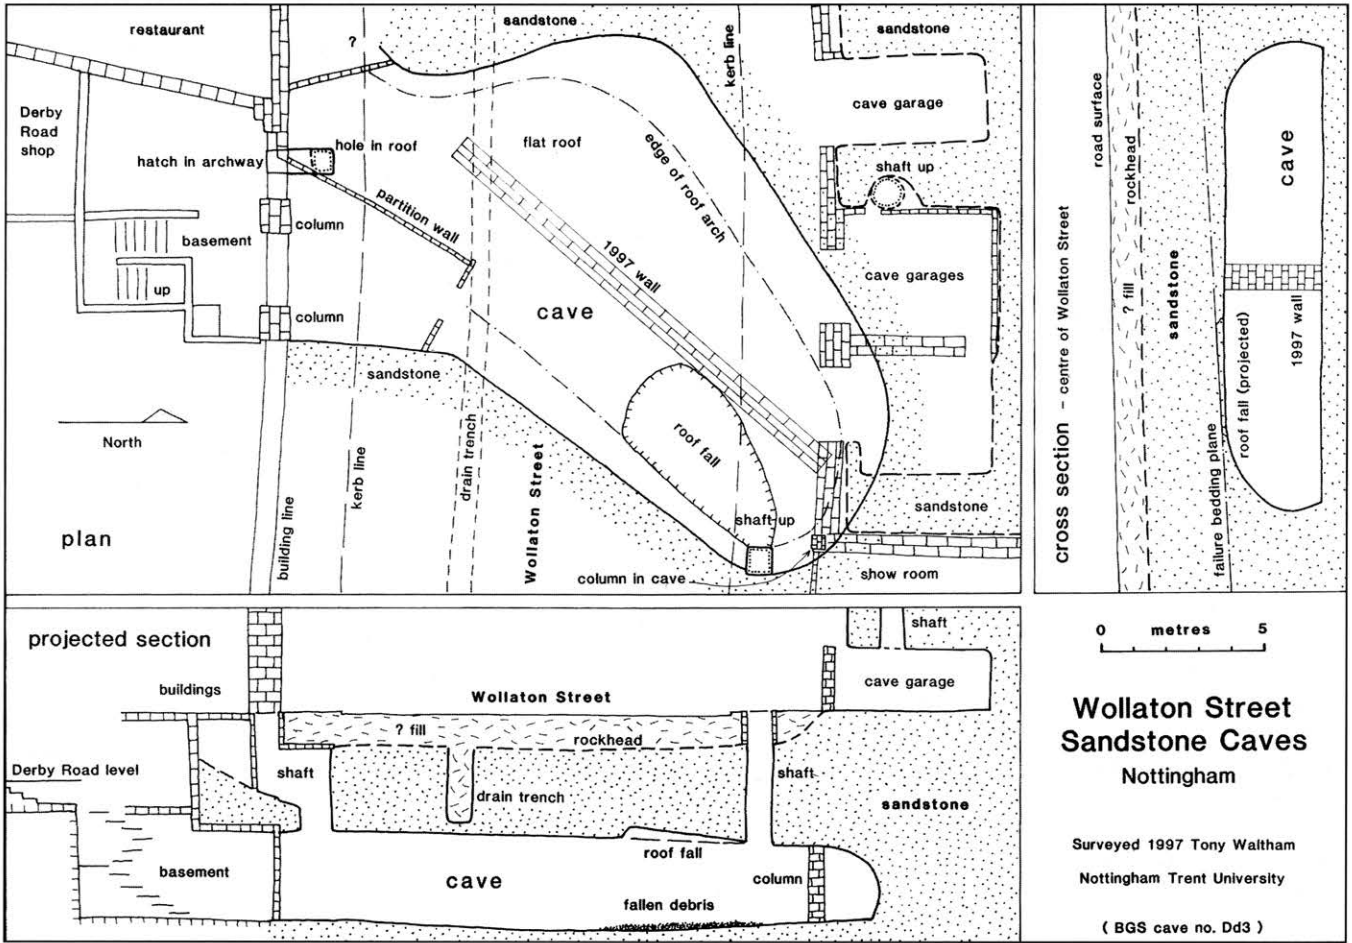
Plan and profiles of the large cave beneath Wollaton Street.
